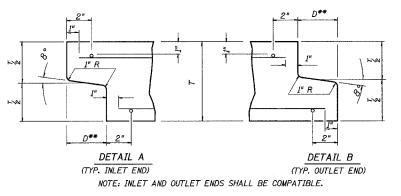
DETAIL OF PRECAST CONCRETE BOX CULVERT M273
